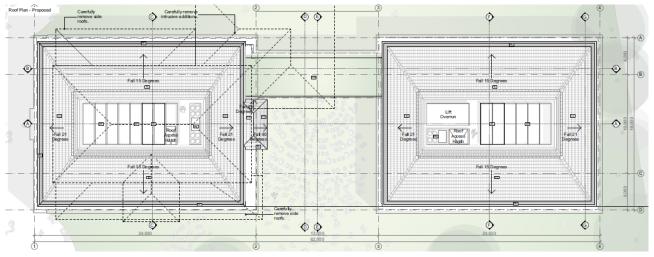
Proposed roof plan. Source: Lockhart-Krause Architects, 2021
